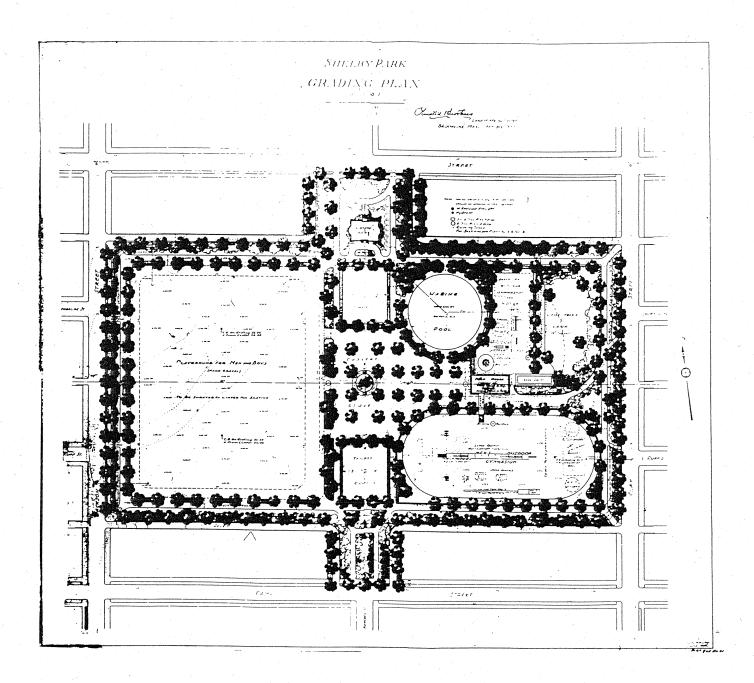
Grading Plan Shelby Park, Louisville, KY, Olmsted Brothers, Brookline, Mass. Courtesy Beveridge collection.
